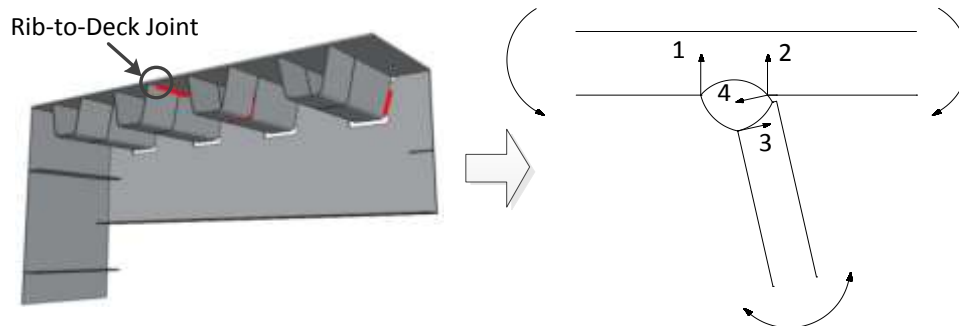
Typical fatigue fracture locations in orthotropic steel bridge decks
